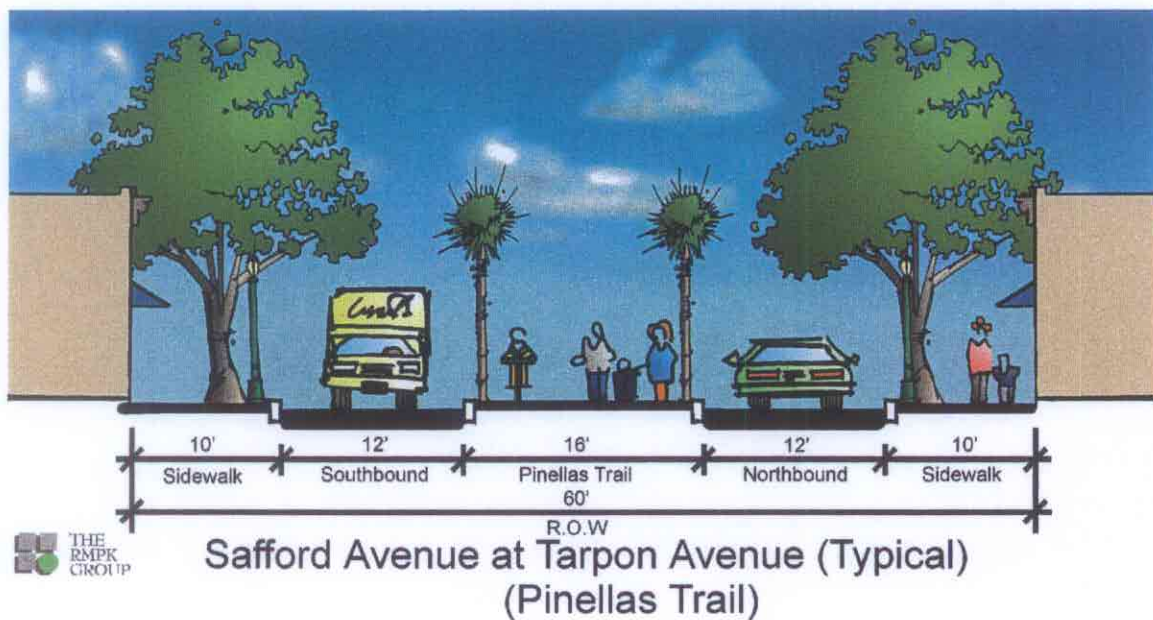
Pinellas Trail/Safford Avenue Streetscape Typical
